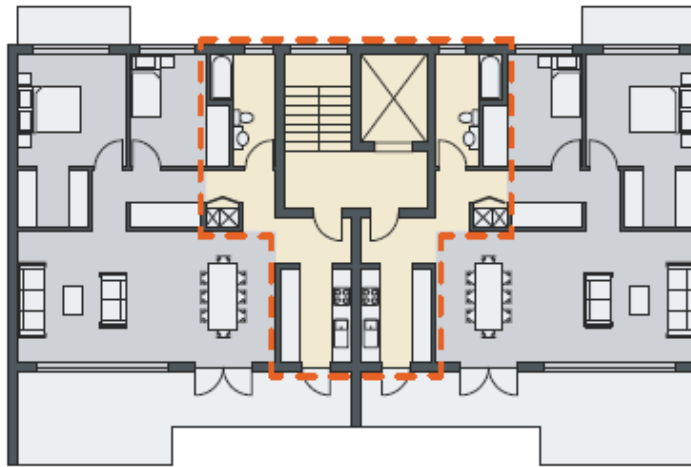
H.2 The building layout should ensure that amenity impacts from noise are reduced to both living areas and bedrooms. The plan above locates living spaces away from the noisy access core
